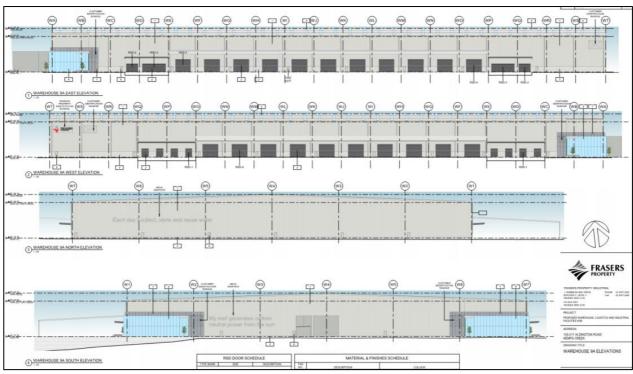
Warehouse 9A Elevations (Source: Frasers 2021)
